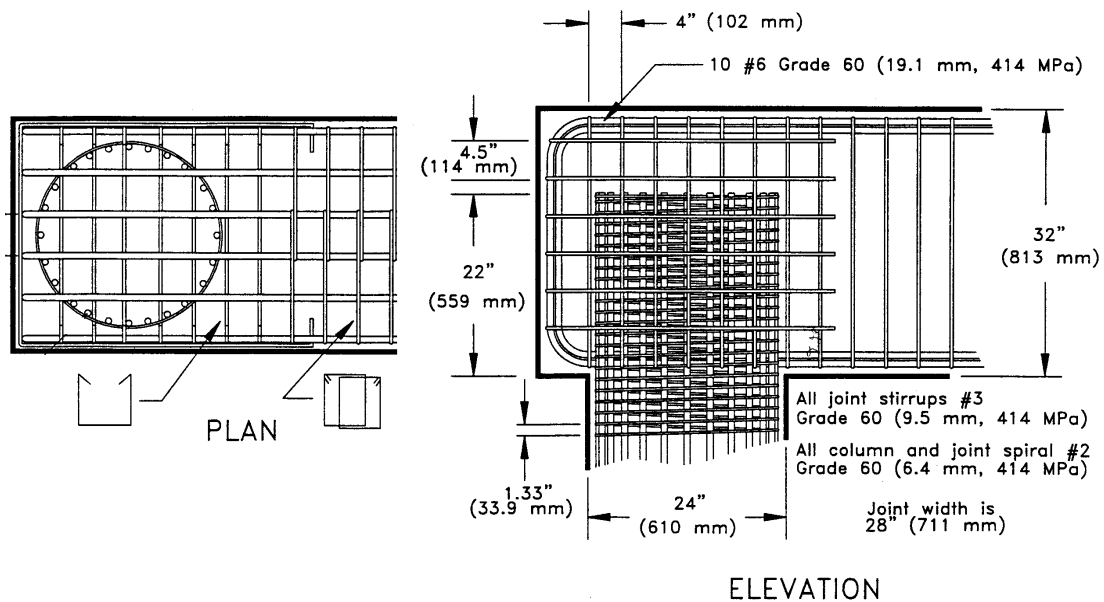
Joint Reinforcement Details of as-Built Specimen with a Circular Column (Adapted from Ingham et al., 1994b)
